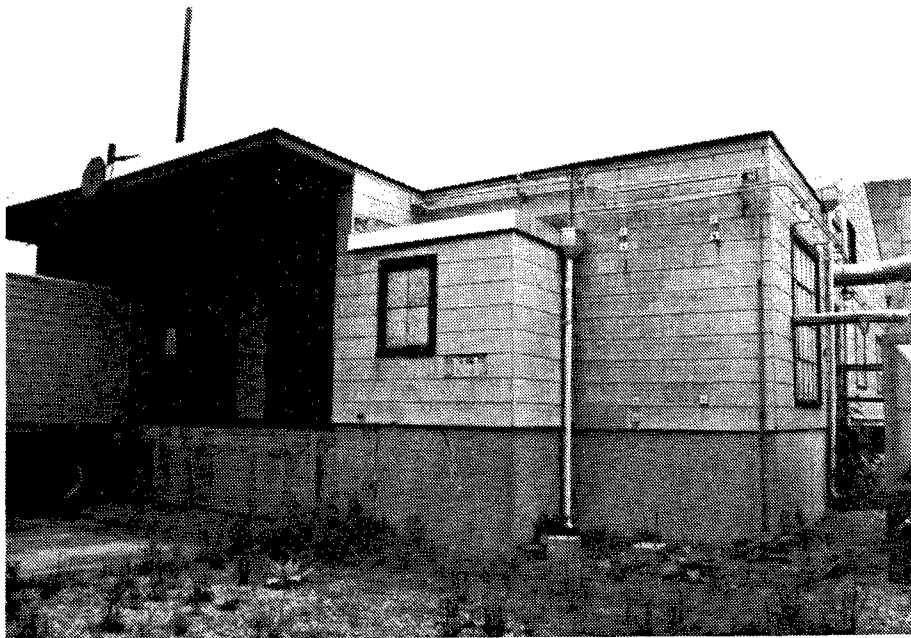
Building N1: Explosives Manufacturing Plant, Packaging Building.
